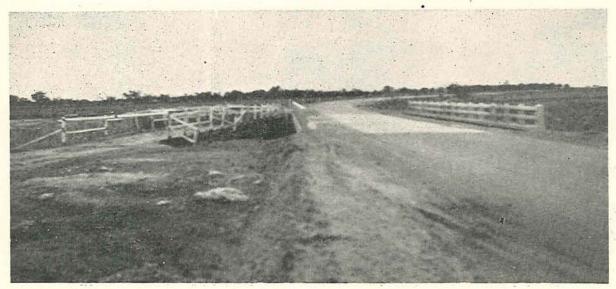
New and Old Bridges over Wandella Creek on the Murray Valley Highway, West of Kerang.
